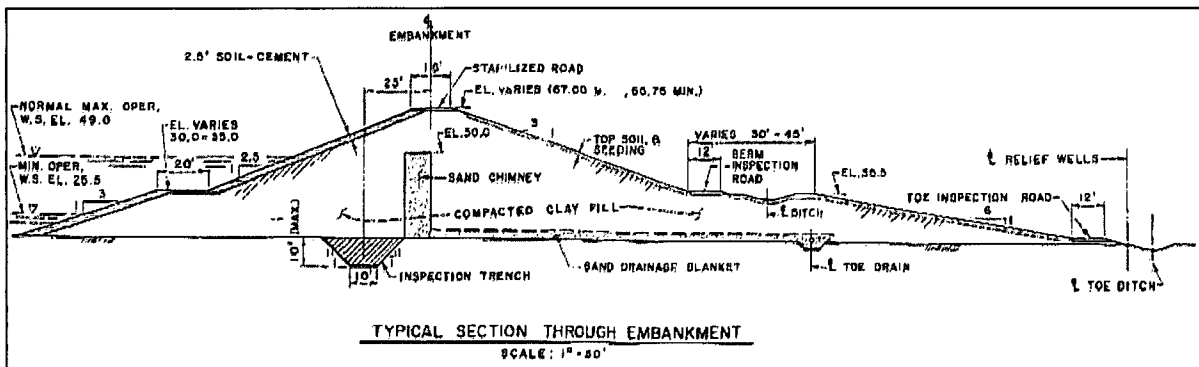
Cross section of the MCR embankment levee (provided by STP)
